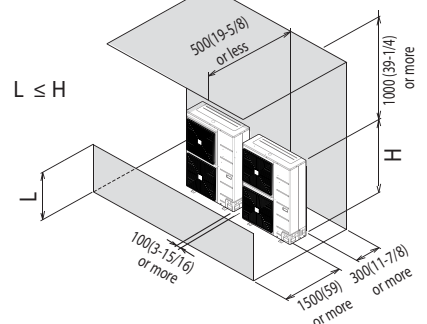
Side by Side—high rear wall and low front wall with building overhang and no side walls
